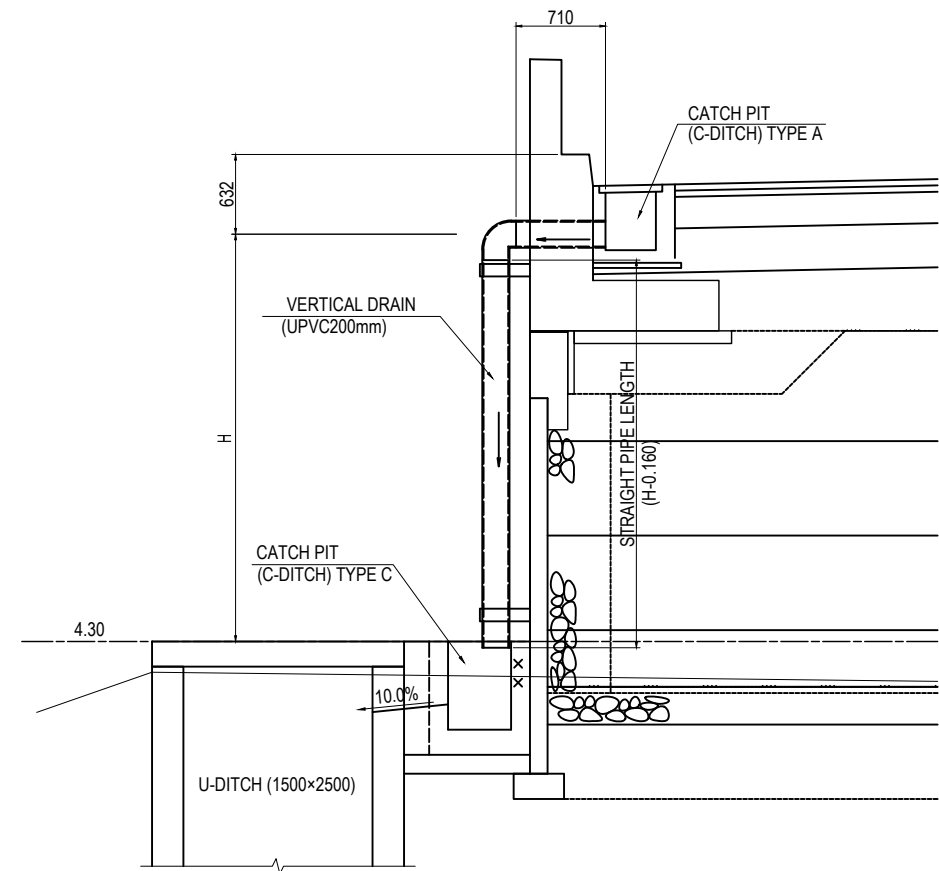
DETAIL OF CATCH PIT (C-DITCH) TYPE A S=1:20
